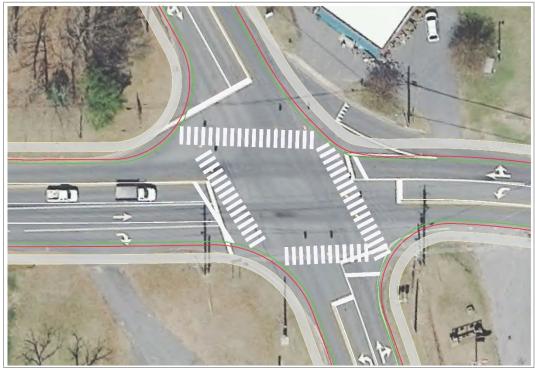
Main Street and Broad Street intersection (existing conditions)
